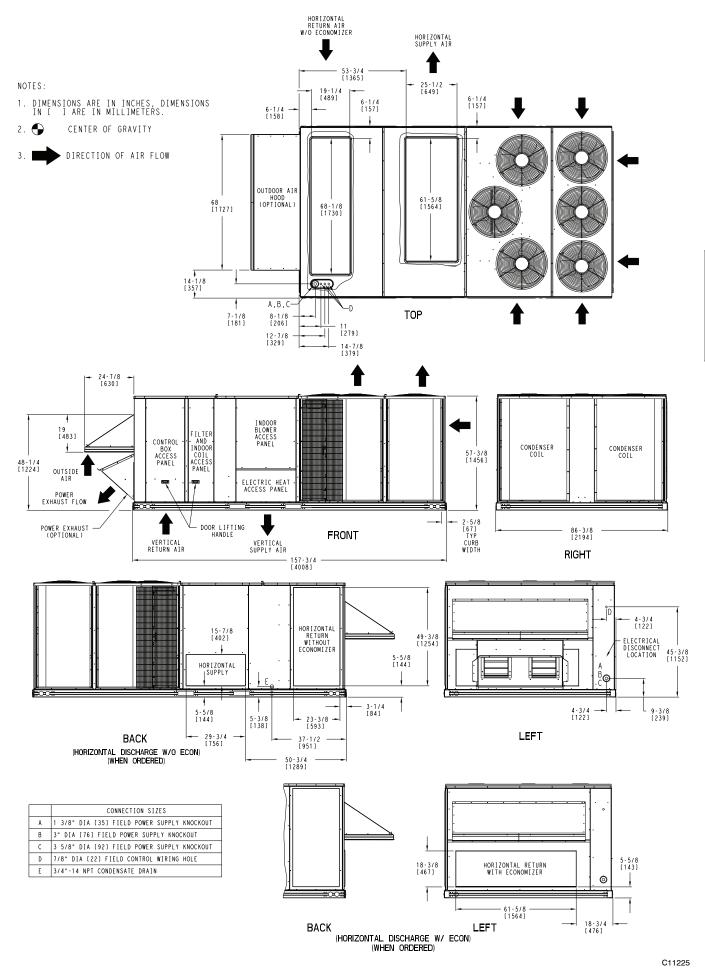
Unit Dimensional Drawing - 30 Size Units
